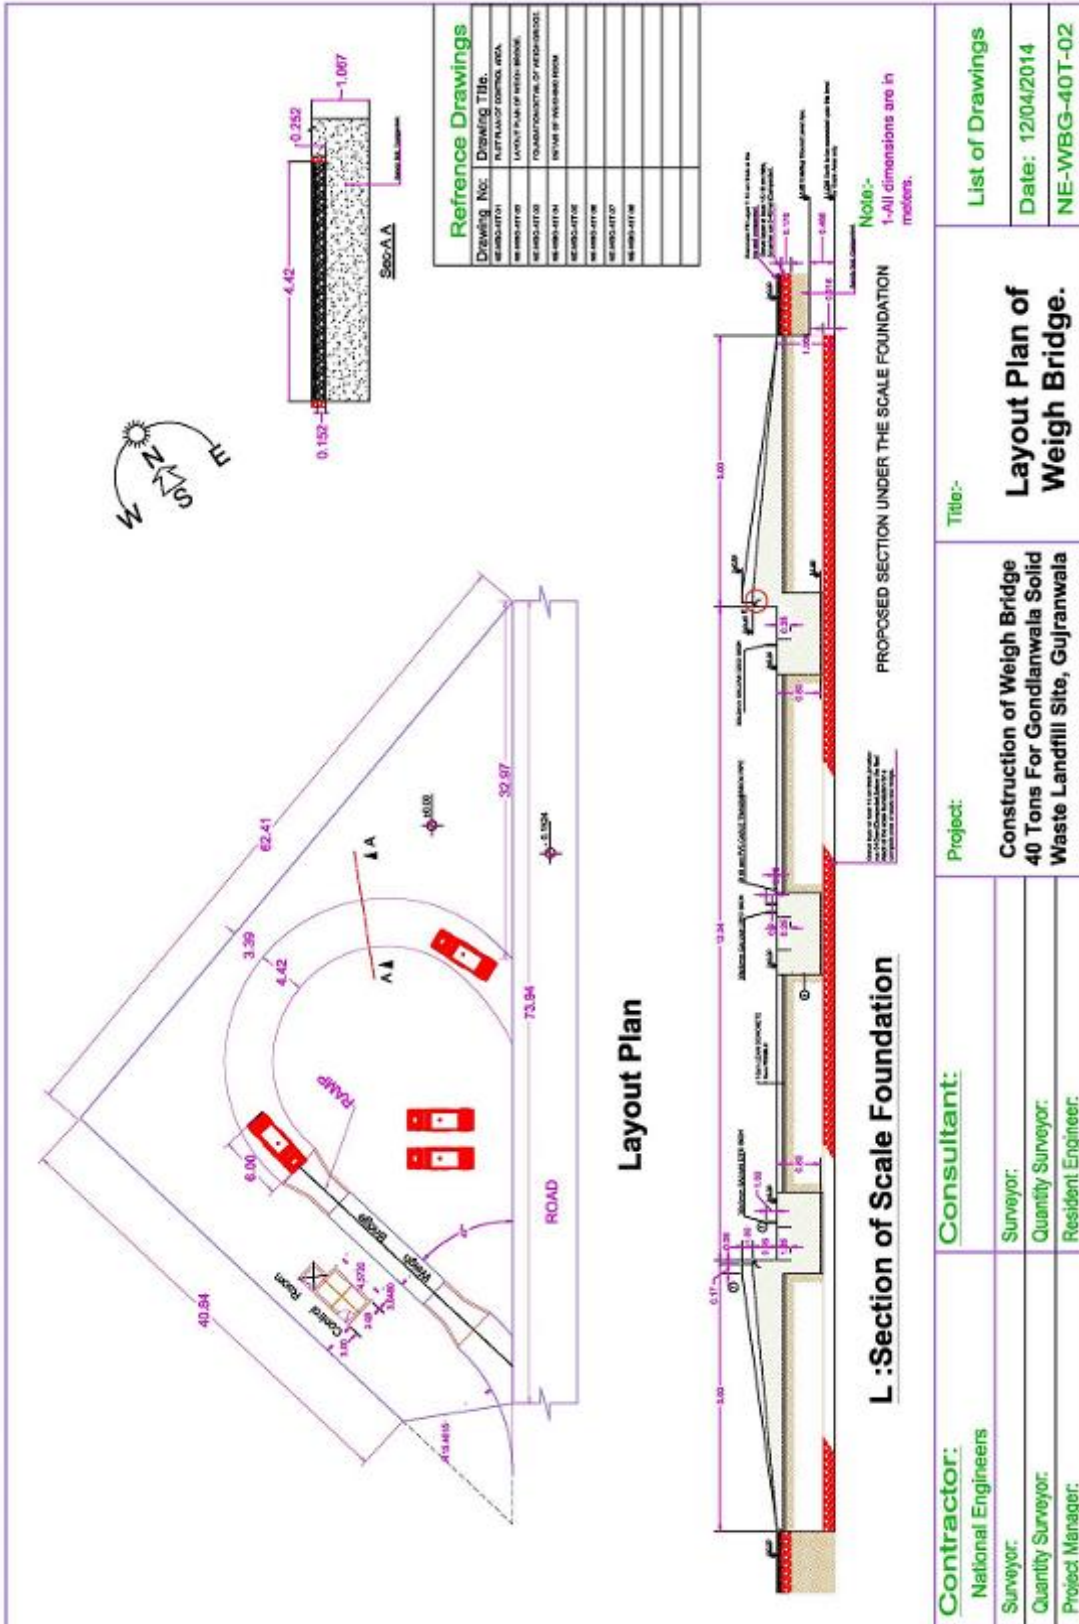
General Plan of Procured Weighbridge at Gondlanwala Solid Waste Landfill Site, Gujranwala
